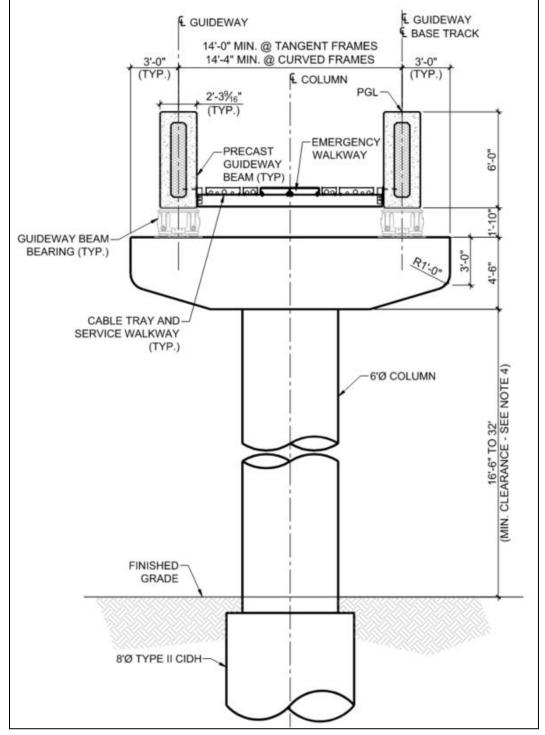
Typical Aerial Monorail Guideway Cross-Section
